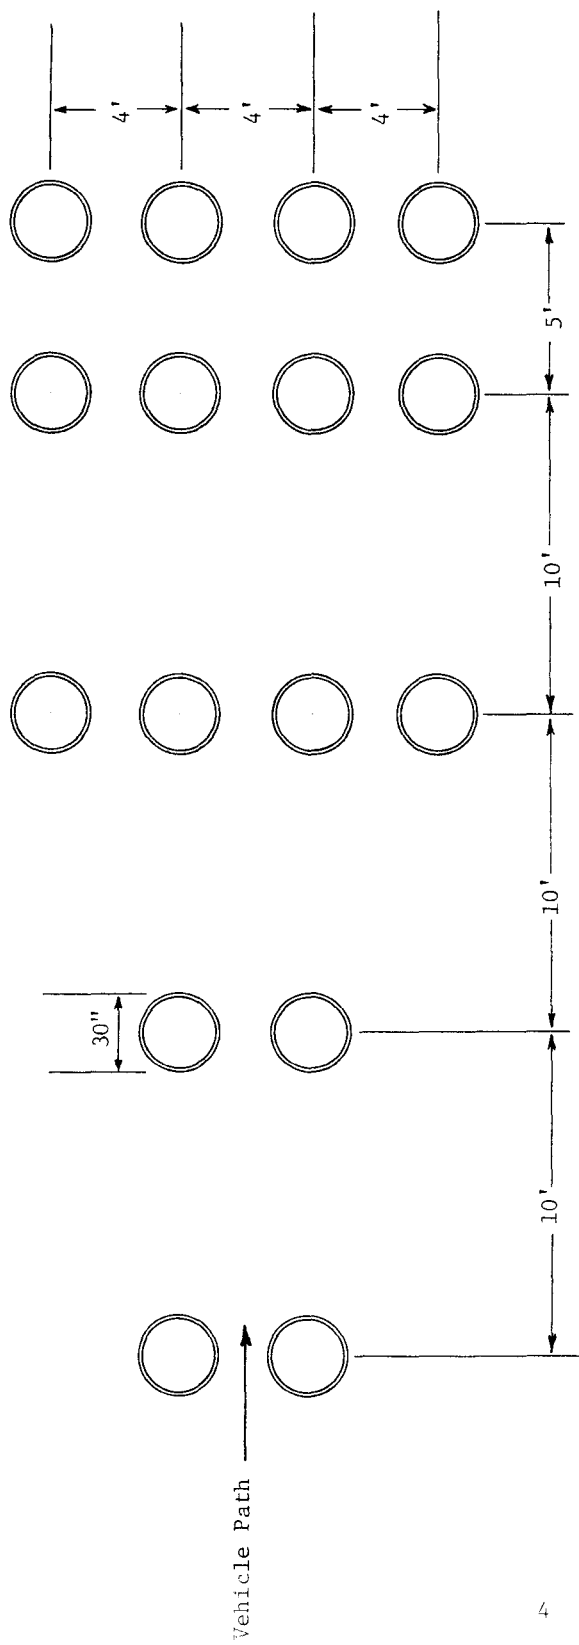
, CONFIGURATION OF REINFORCED CONCRETE PIPE CRASH CUSHION
